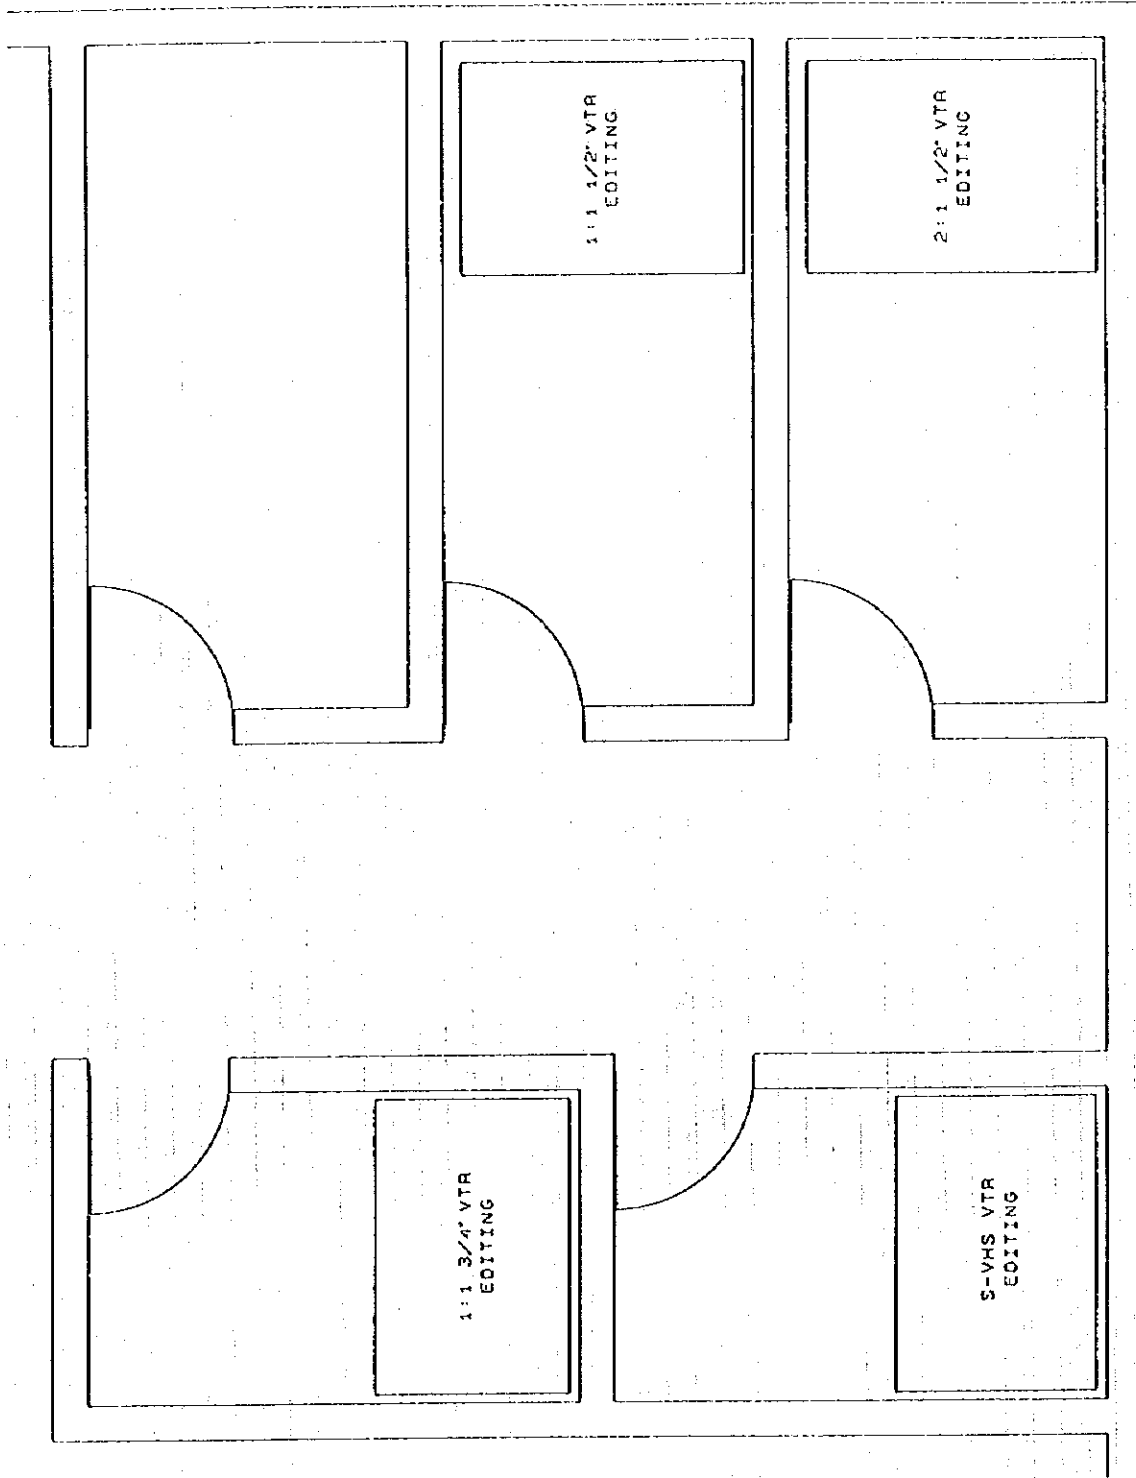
PHNOM PENH TV STATION, VTR EDITING ROOMS EQUIPMENT LAYOUT
